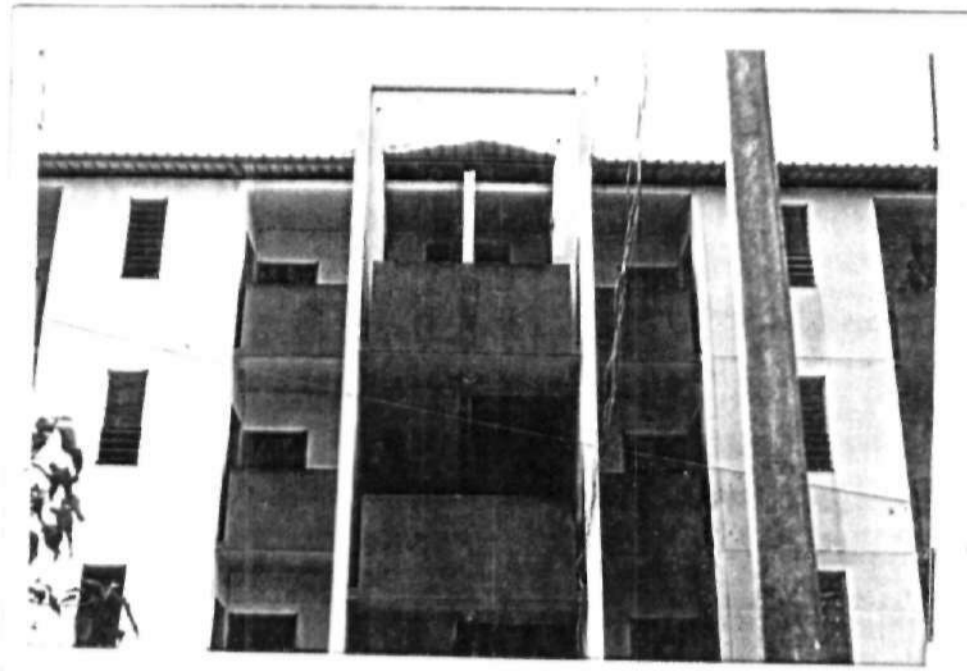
Steel purlin not well - secured to the roof beam being blown off
